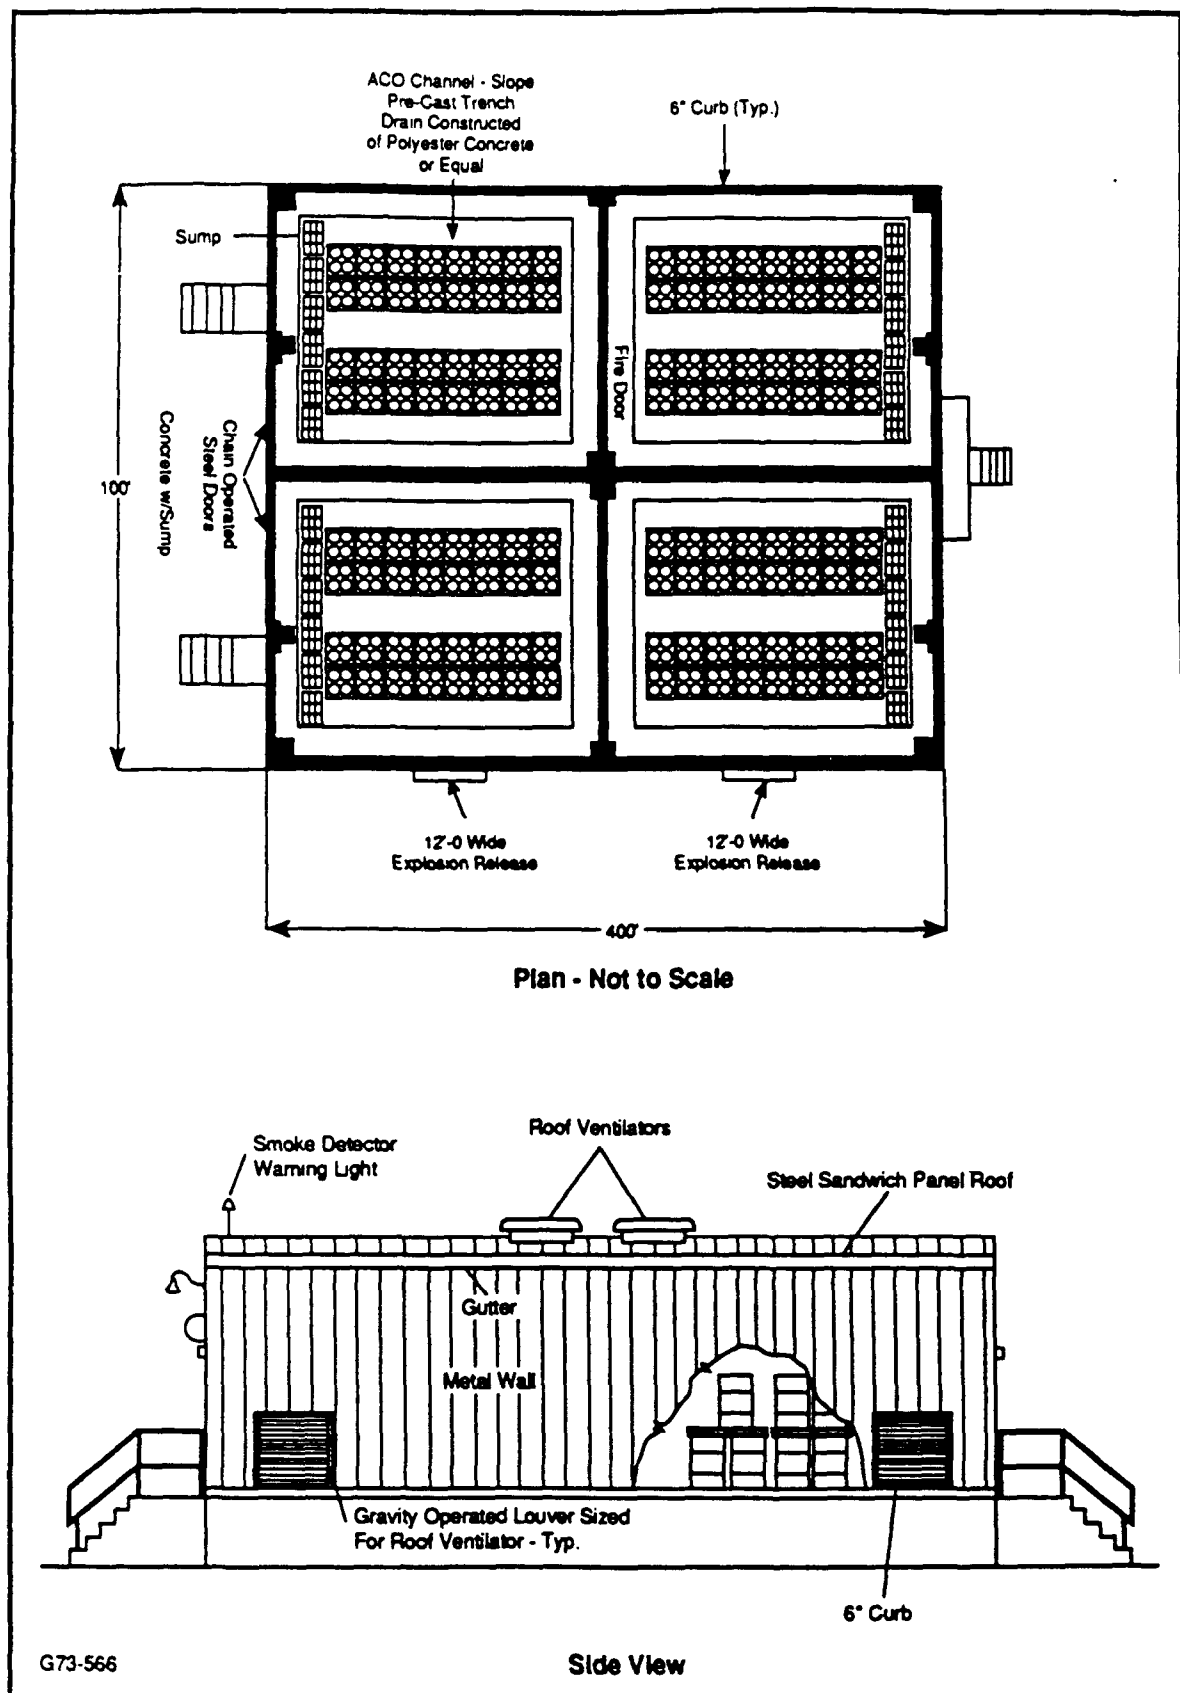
CONTAINER STORAGE BUILDING -
